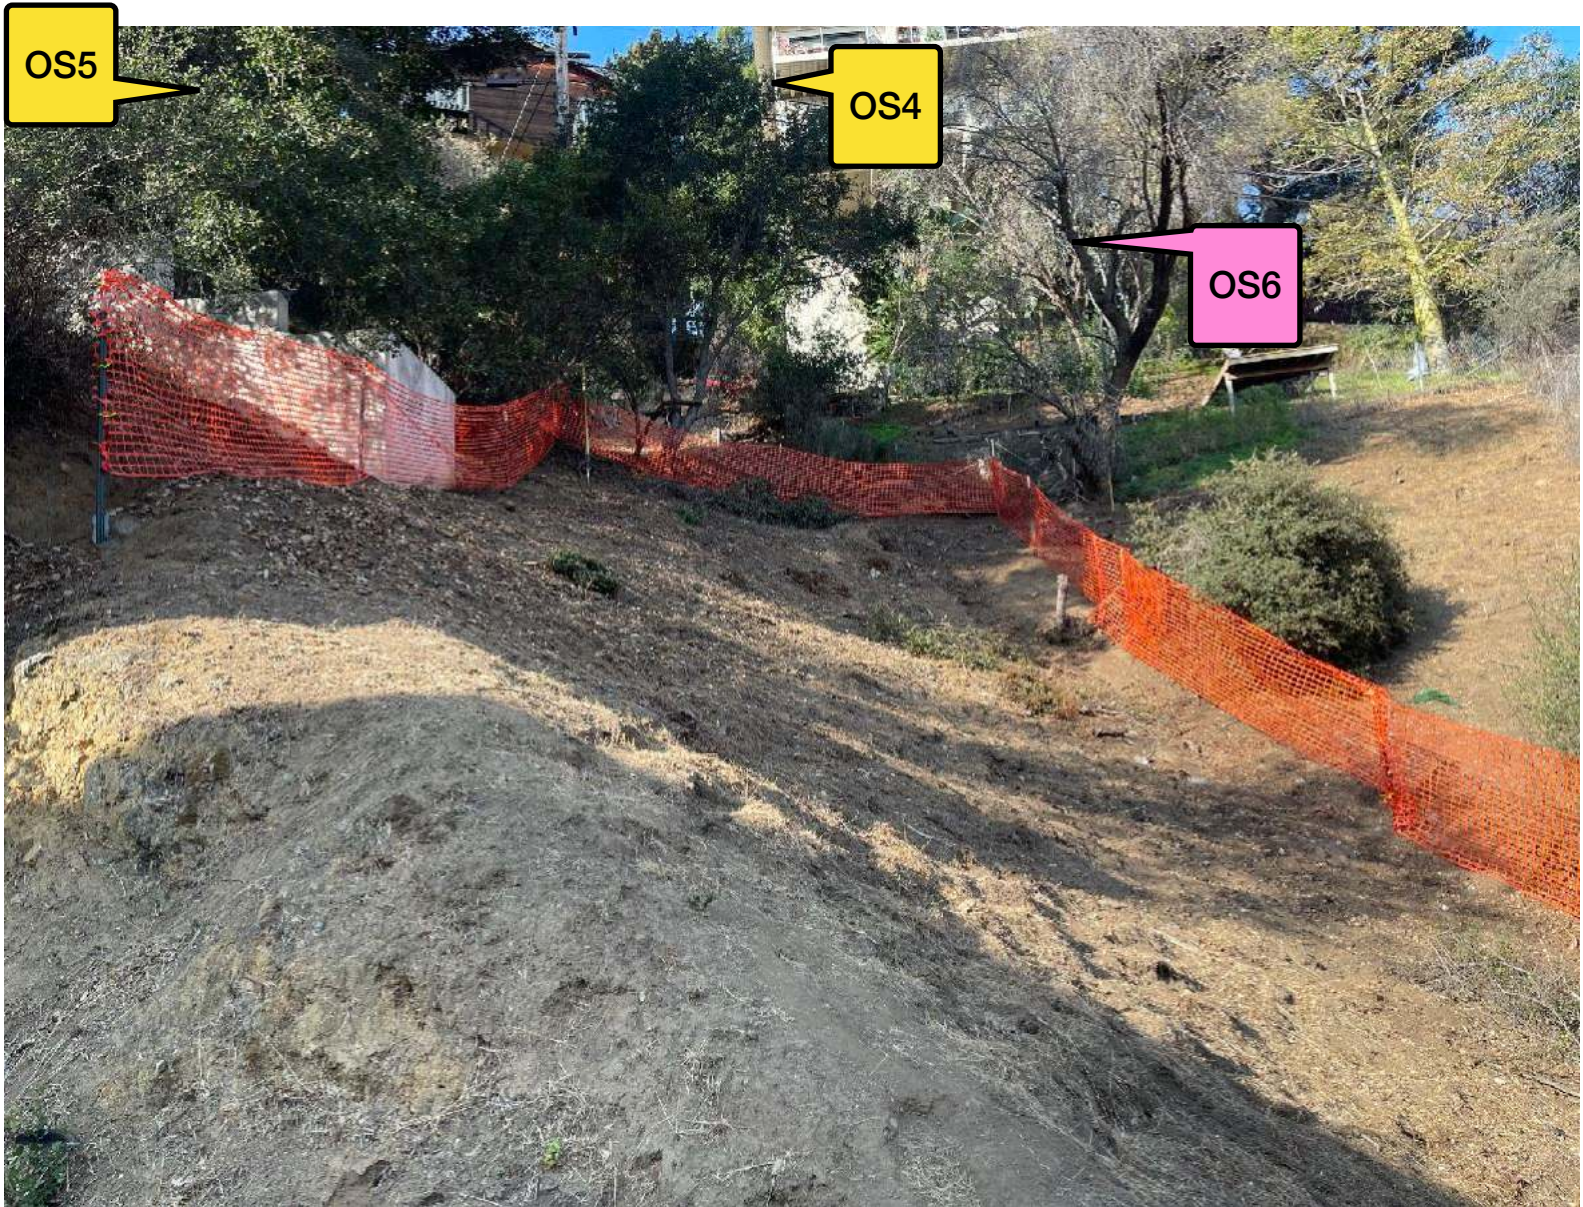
Shows Off Site Mexican elderberry (*Sambucus mexicana*) tree #OS6. This tree will receive no impact and will be retained. This tree is off-site in the "sewer easement" area that extends about 6 feet across, this tree is poor condition and is almost dead, most likely due to drought conditions.
